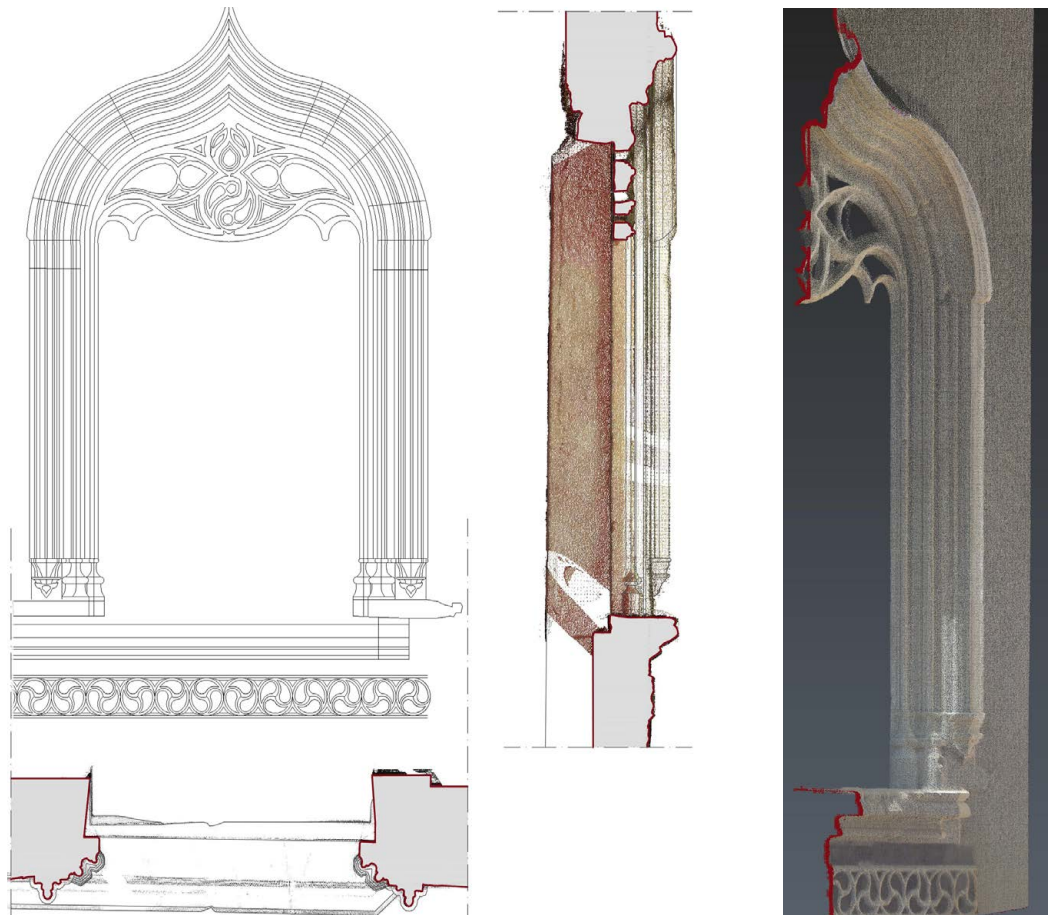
Survey of the single-lancet window of Palazzo Ciampoli in Taormina (ME). Redrawing on the point cloud: elevation, plan and vertical section. Elaboration by the authors.
